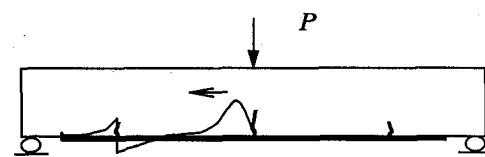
Debonding mechanism for plain concrete beams strengthened with FRP
